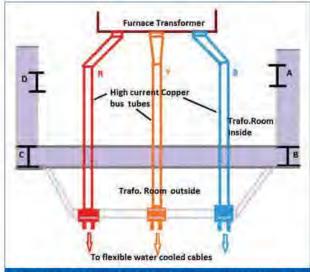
Sketch showing the plan of the transformer room, Steel columns, high current secondary side bus tubes etc.
